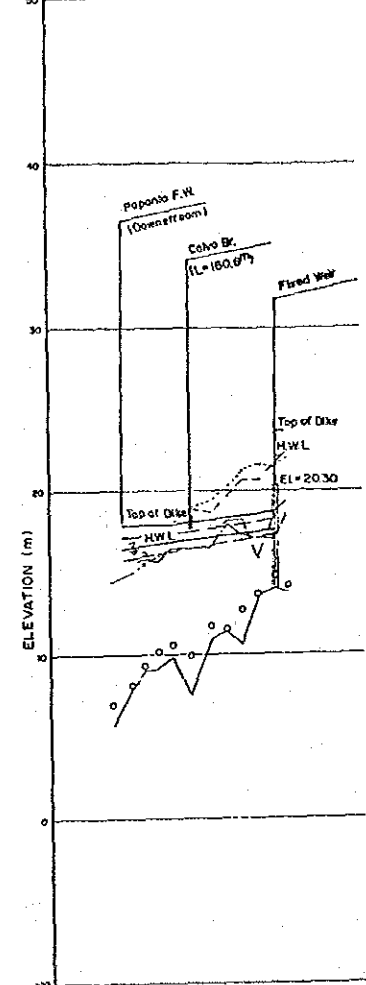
DESIGN PLAN OF ALLIED RIVERS
